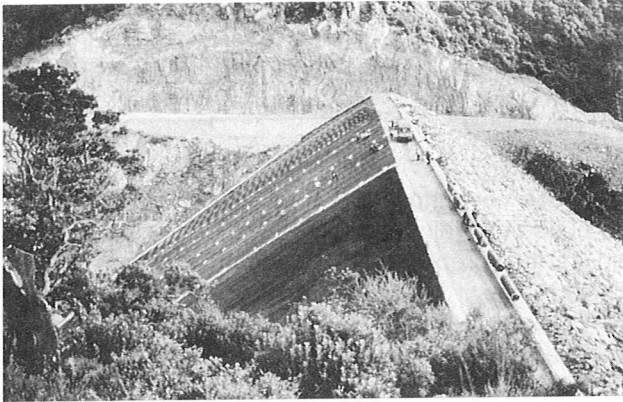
Bituminous geomembrane being laid at Ortolo dam
